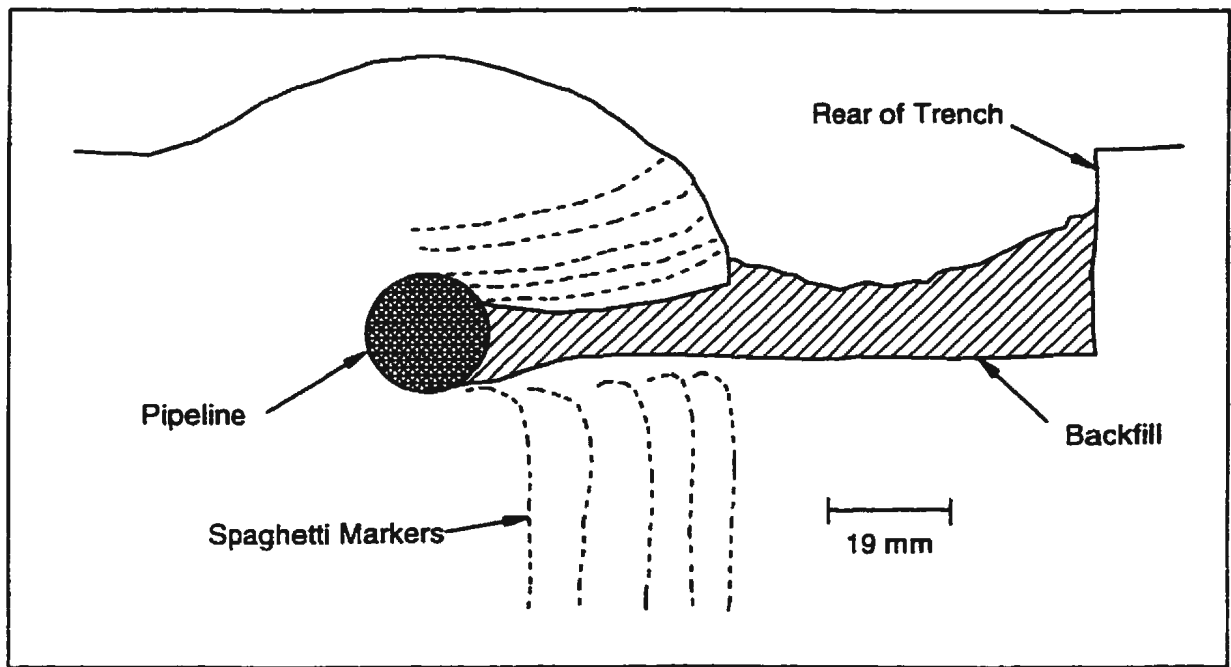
Sketch of excavated cross-section along mid length of model pipeline #1, 16mm cover, Test 01.
